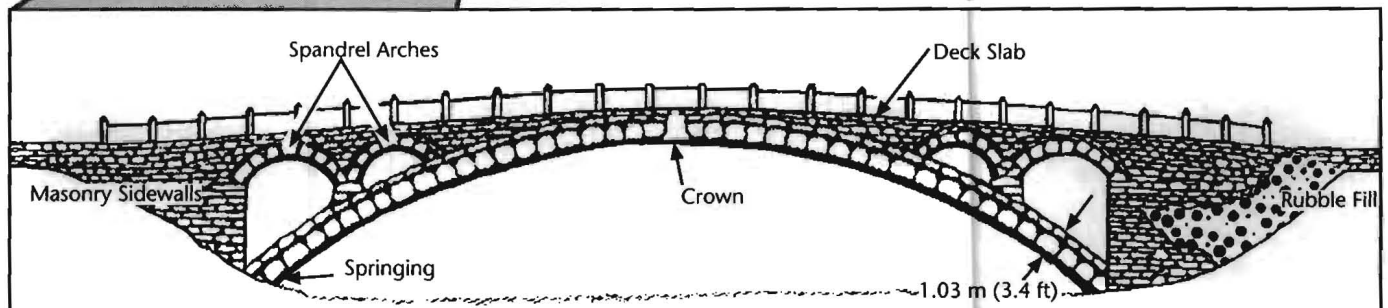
Schematic of the Zhaozhou Bridge built around 600 A.D.
